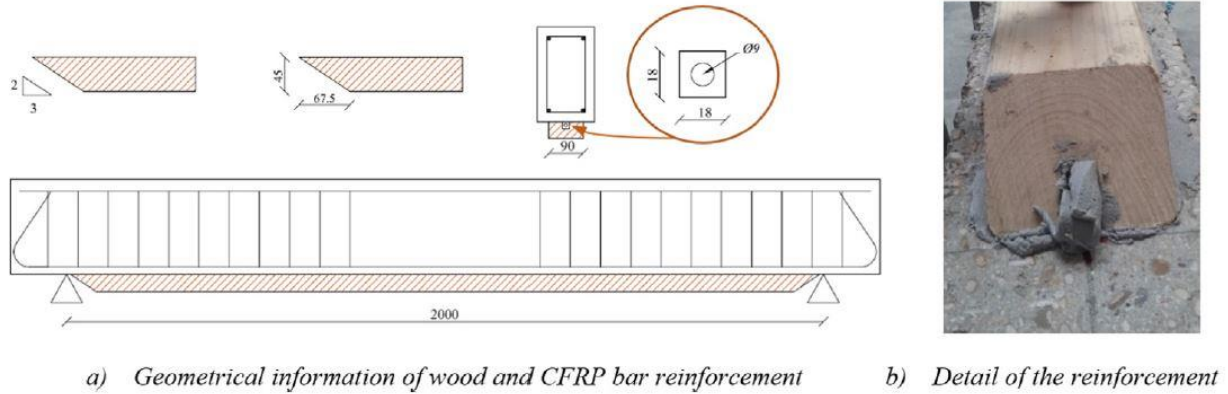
Details of the wood reinforcement with the CFRP bar. (Gracide et al. 2020)
